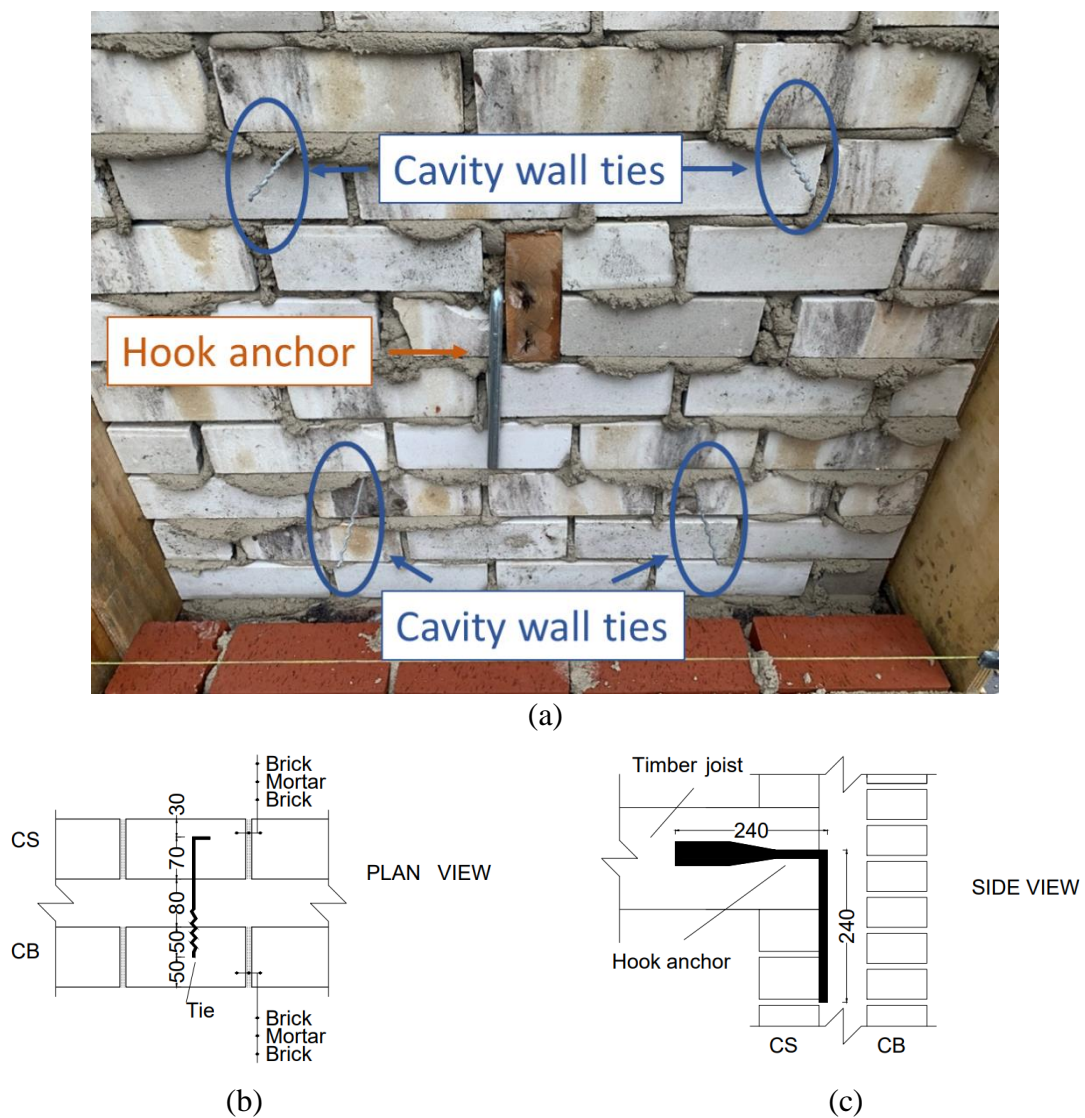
Connection details: view of the external side of the inner leaf of a cavity wall (a), cavity wall tie connection (b), and hook anchor connection (c) (dimensions are in mm).
